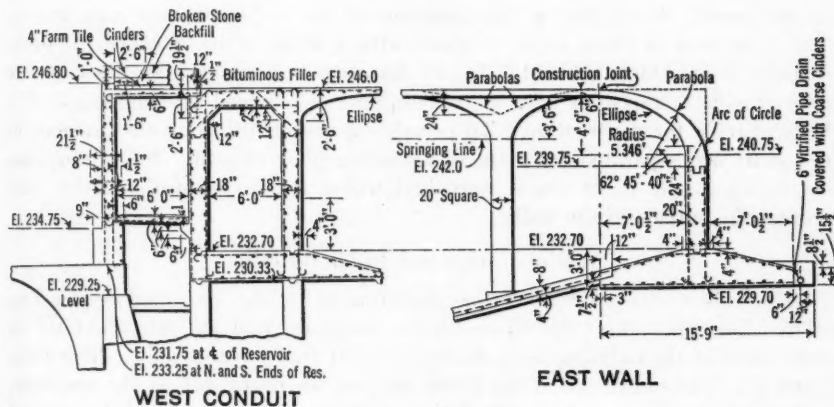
COAGULATION BASINS: DETAILS OF WEST CONDUIT AND EAST WALL.
